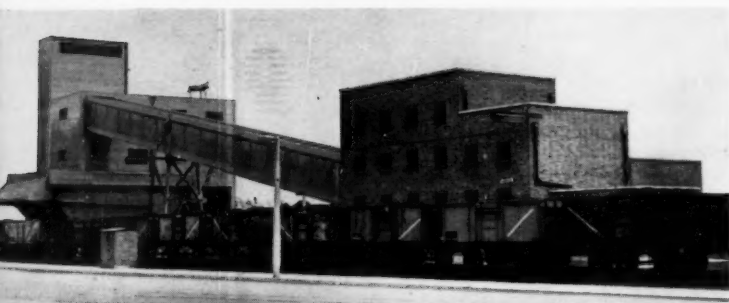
General view of combined tippler house and stocking-out conveyor tower (left) and combined junction house, automatic weighbridge house and sampling house (right), with coal wagons in foreground
